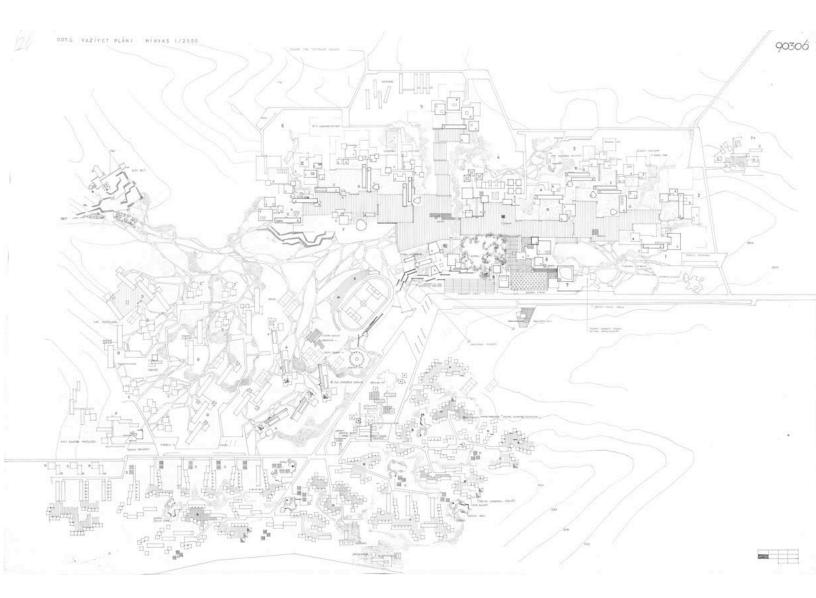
The second drawing board, general site plan of the campus (1/2000).
